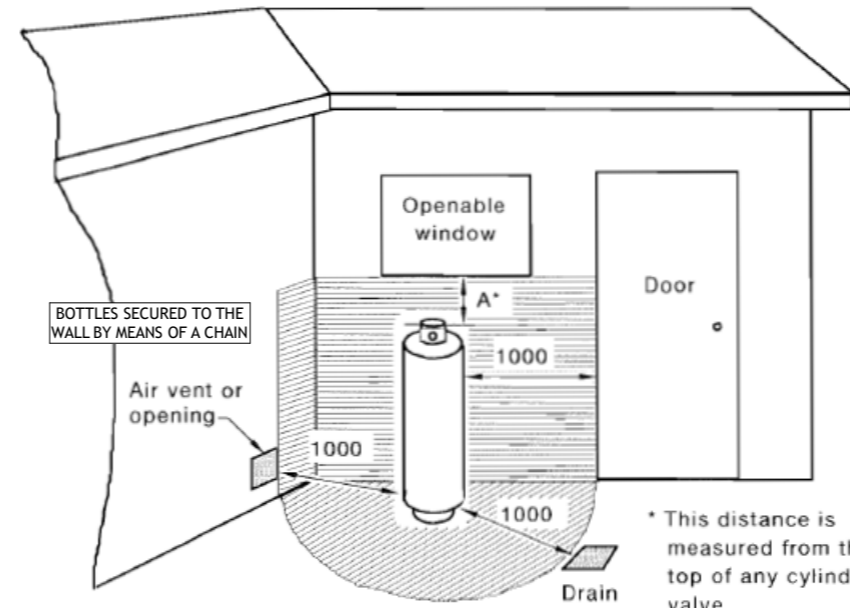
MINIMUM CLEARANCE TO IGNITION SOURCES
